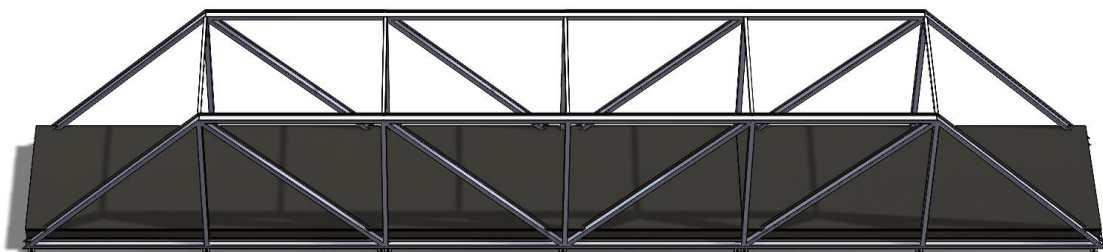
Truss bridge. (Jordi Mata Garcia, 2021)
